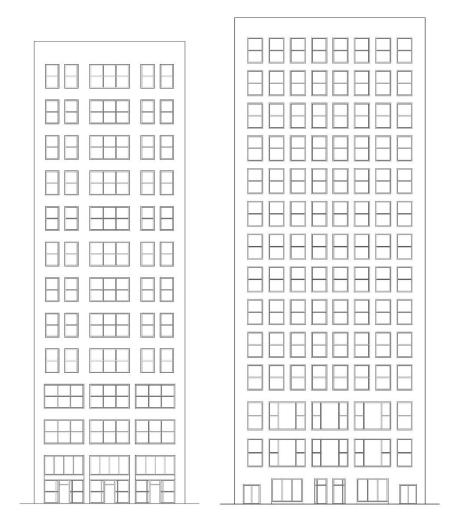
Building 8 elevation (1981); Building 17 elevation (1984); 1" = 32'.
